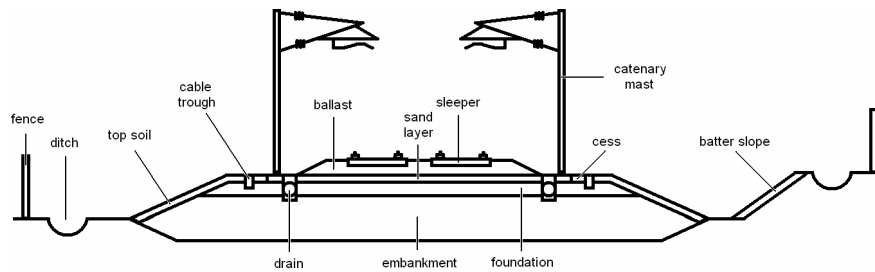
Schematic cross-section of a railway (not to scale) with some key elements noted, modified from (*Coombs, 1971*)
